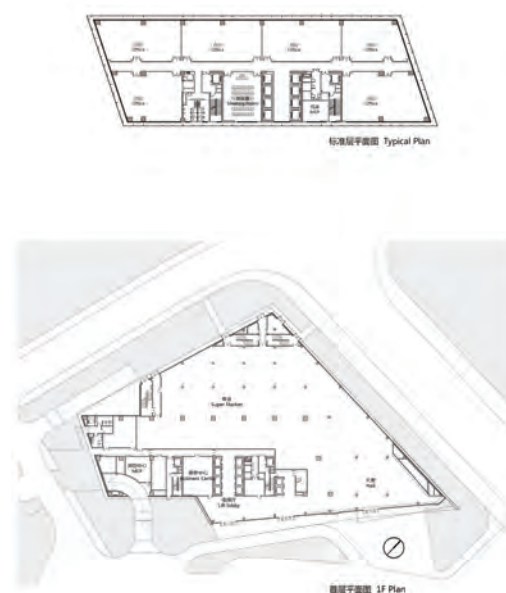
1st floor plan and the typical plan (Source: Yang, Ni)
